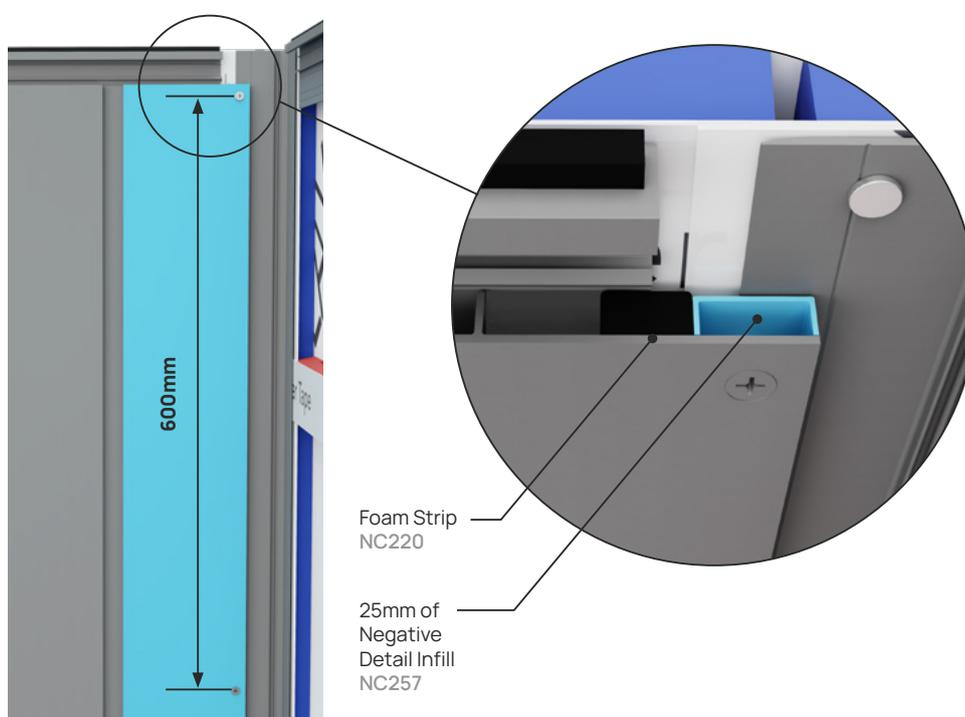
RIPPED BOARD FASTENING AND PACKER
